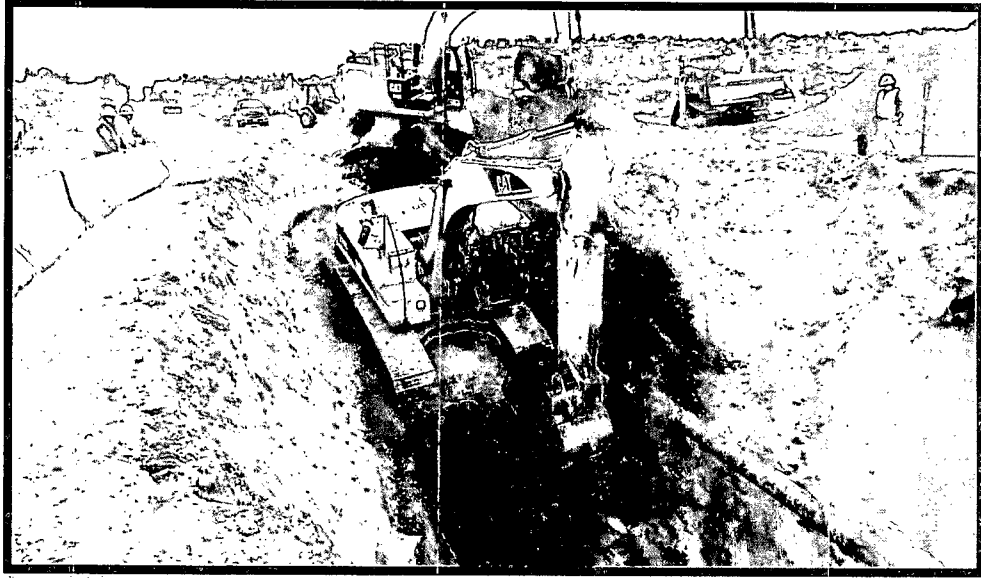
Heavily stained soils were encountered in the east end of the excavation however contamination was not detected in laboratory samples.
